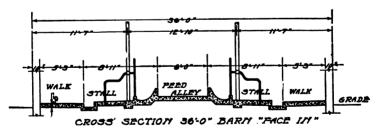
A cross-section of a 36-foot dairy barn—cows faced in.
